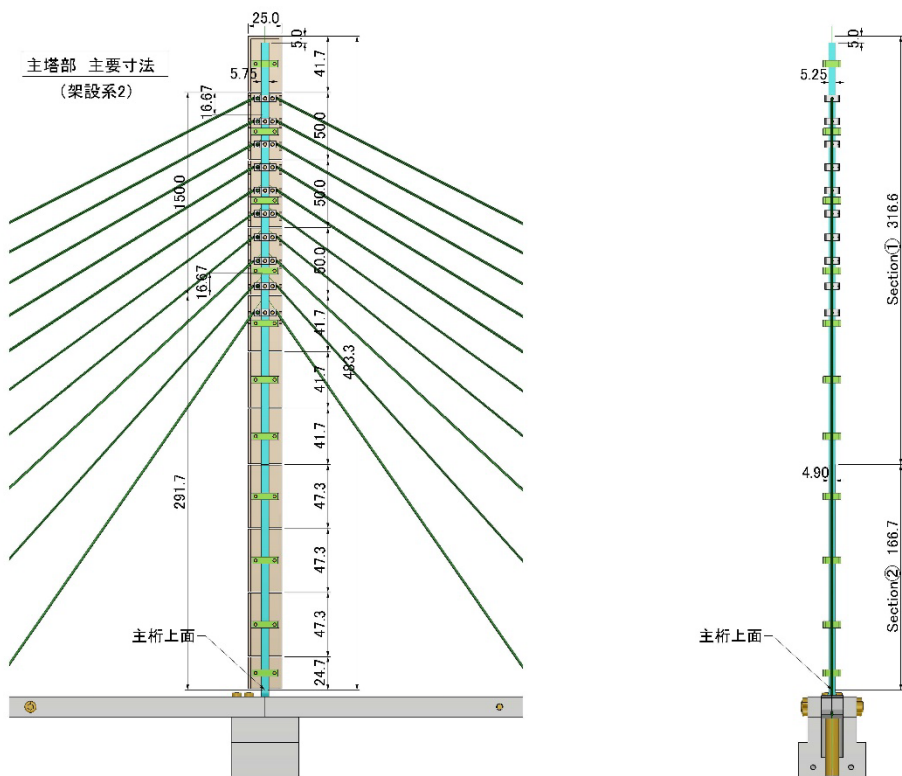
The tower and elastic bar with additional mass arrangement (unit in mm)
